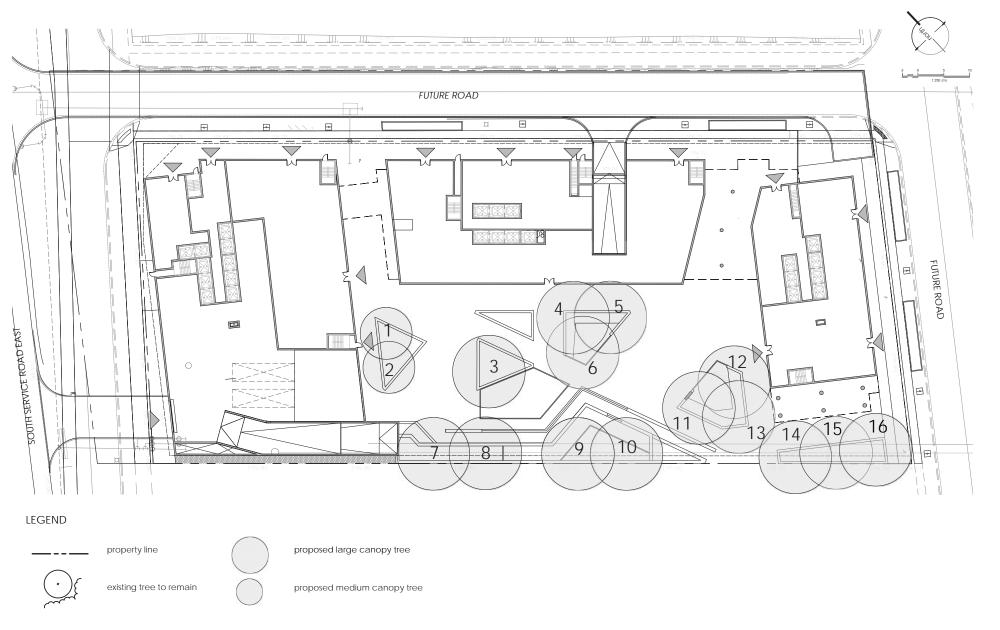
Tree Canopy Cover Plan (Prepared by: Adesso Design Inc.)
